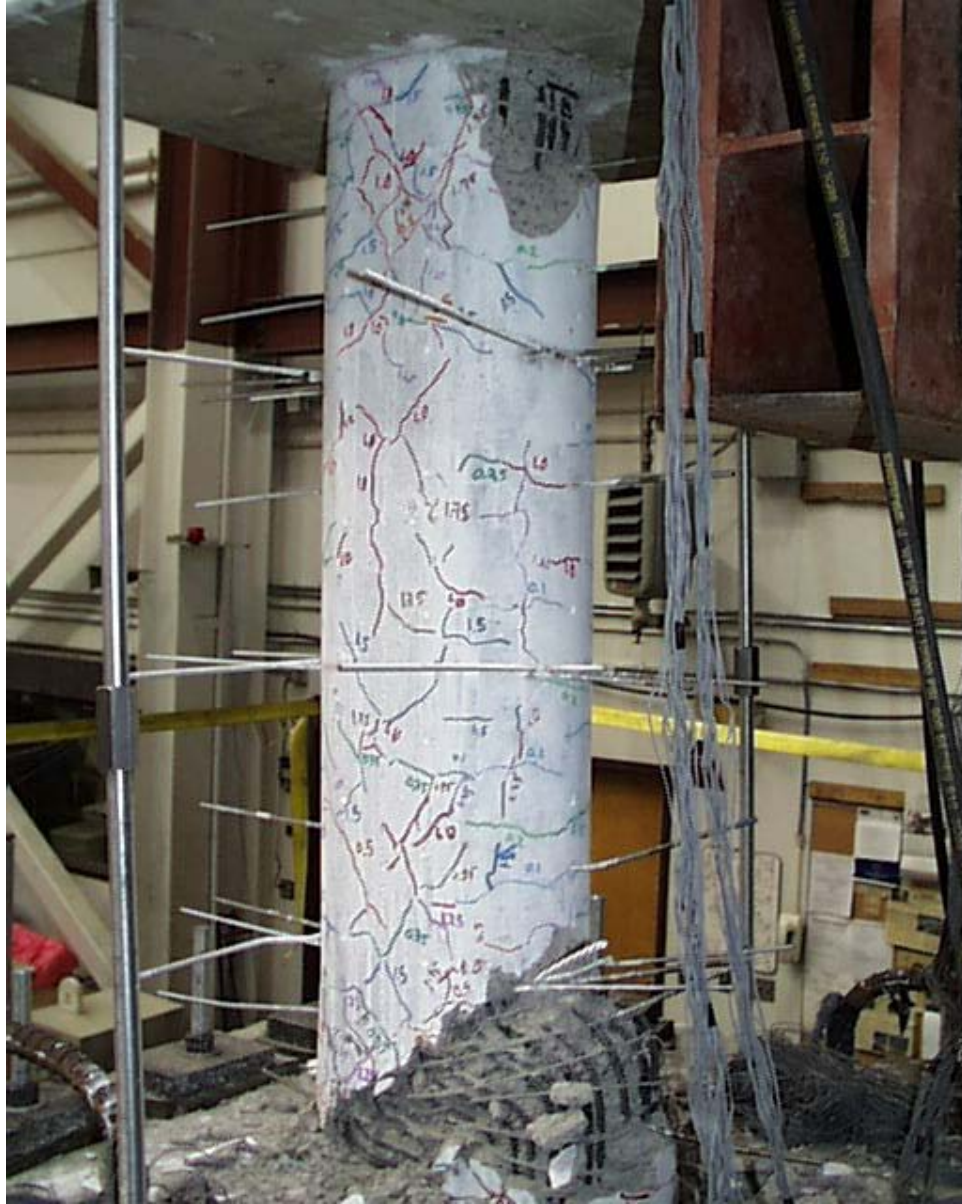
Shear Failure at the Bottom of the Column ($\mu_d = 4.7$) Specimen ISH1.0
